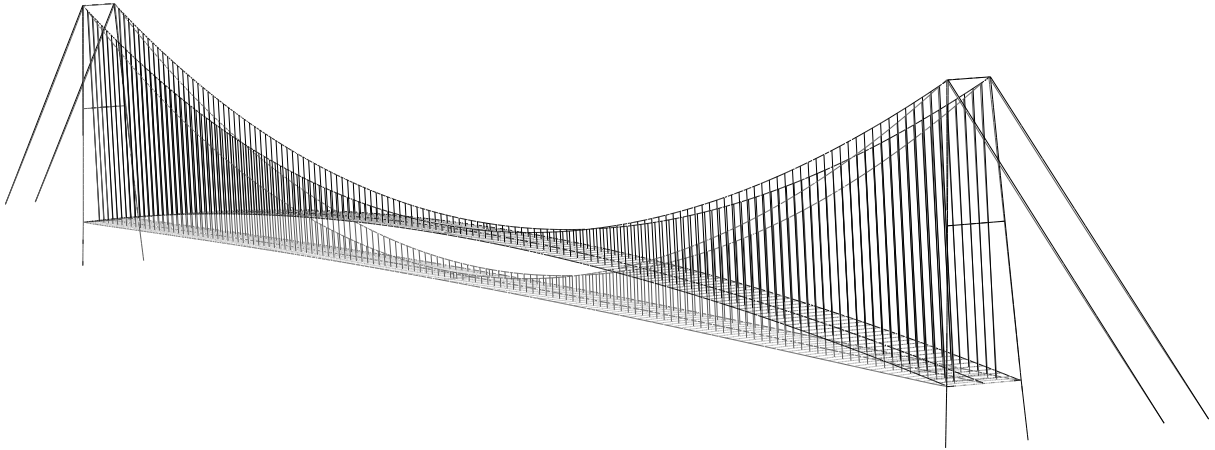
Geometry before and after the *STATIC tensioning step. Example setup: Girder height mid span before tensioning = 45m. Girder height after tensioning = 8.5 m.
